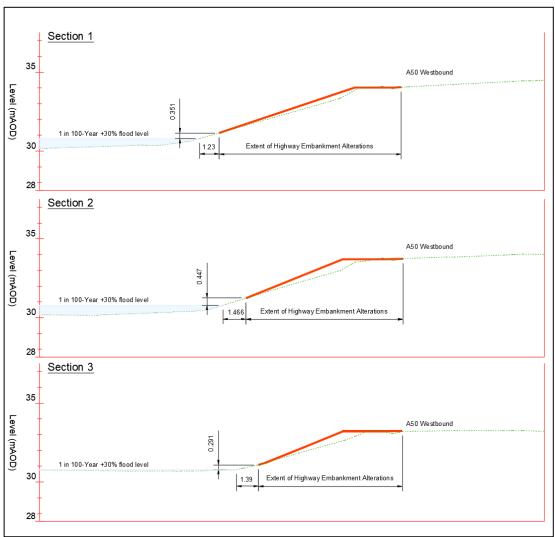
Section View, A50 Highway Embankment Alterations next to the Trent Floodplain - Works No. 11
